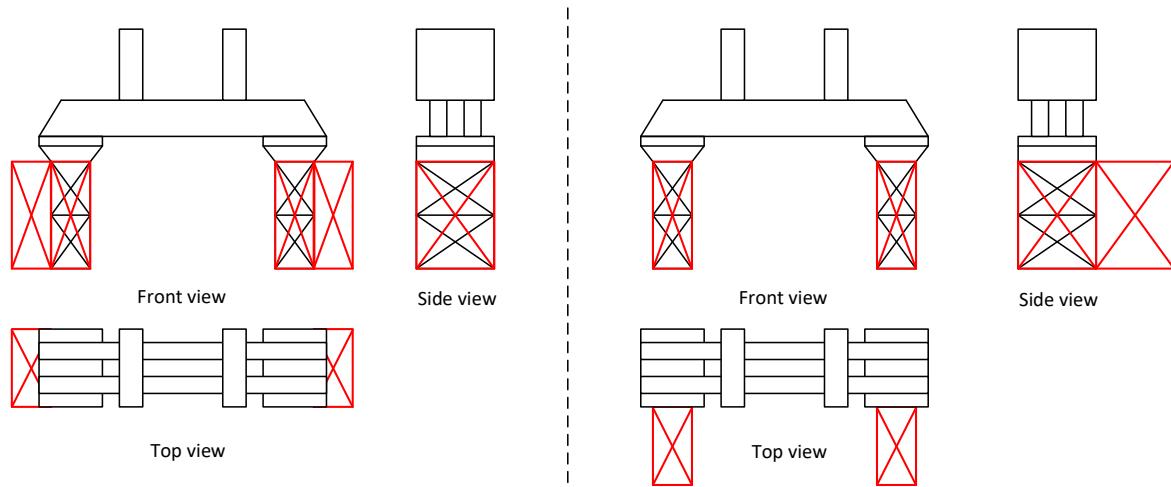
Climbing frame, in longitudinal direction (left) and in lateral direction (right)
